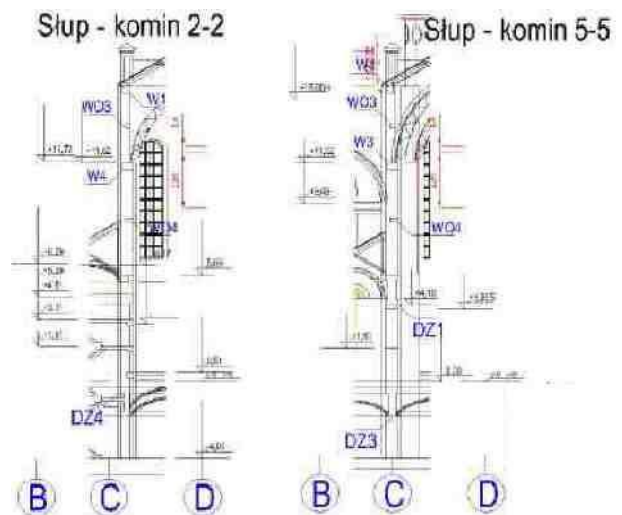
Two typical masonry-reinforced-concrete columns-chimneys. At top over roof is visible decorative element with sculptures, PB-K-97a, A3.
